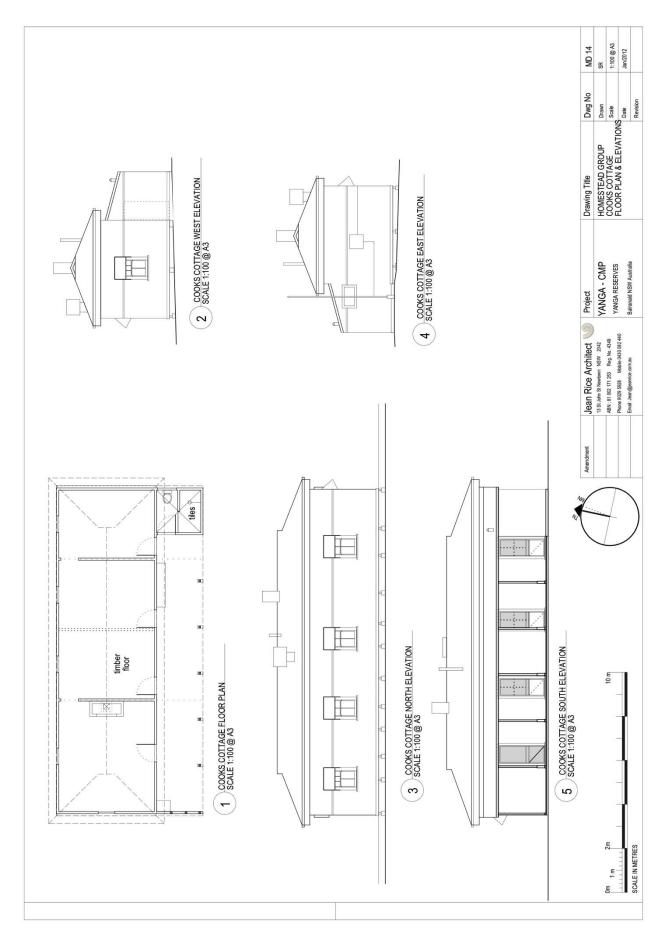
Homestead Group Cook's Cottage floor plan. and elevations. Jean Rice Architect, site assessment 2009
